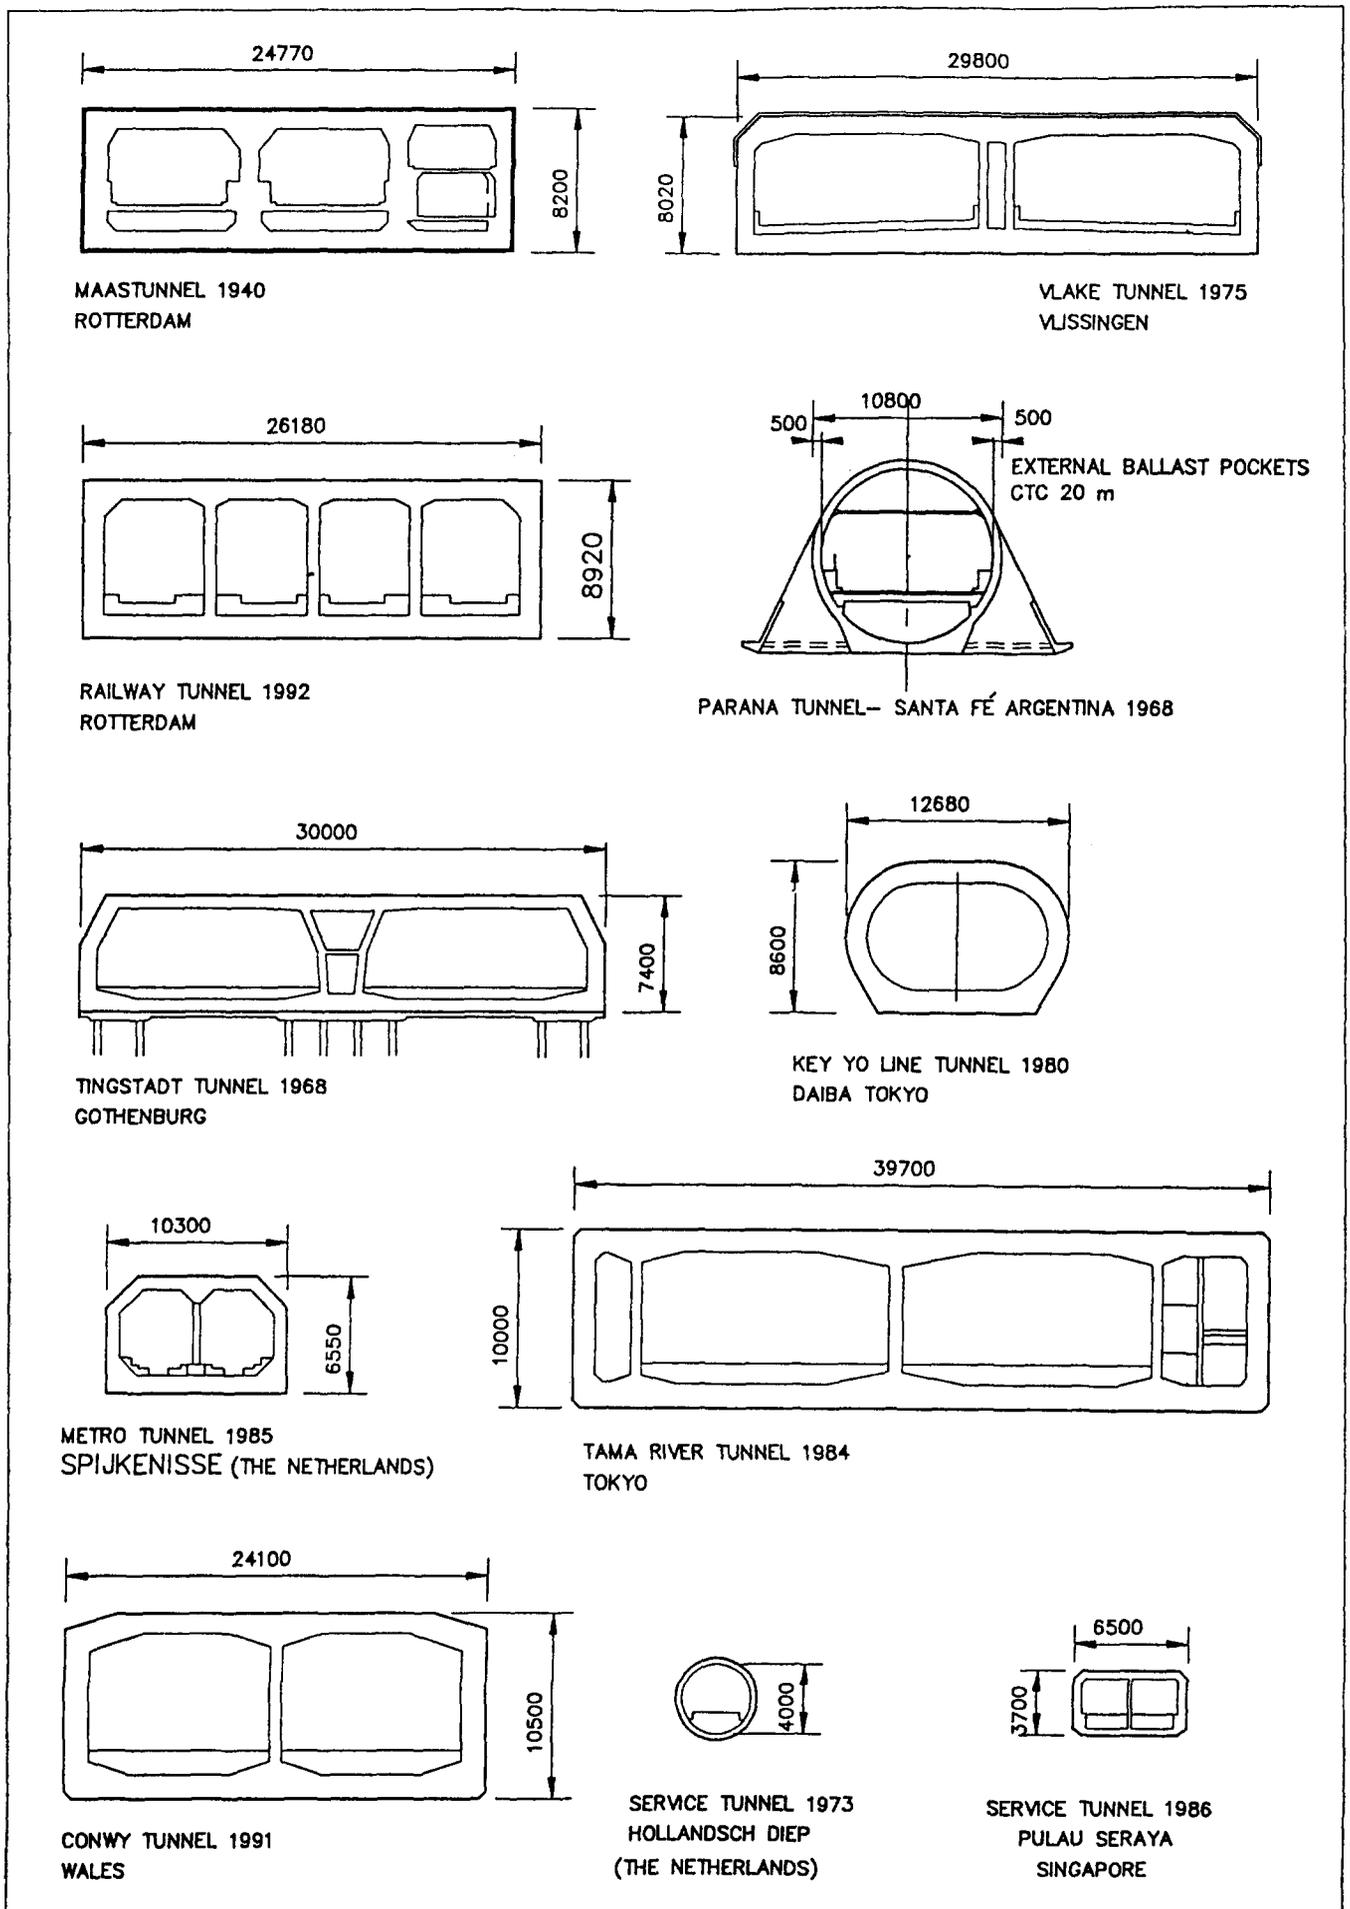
Examples of cross-sections of immersed concrete tunnels.
